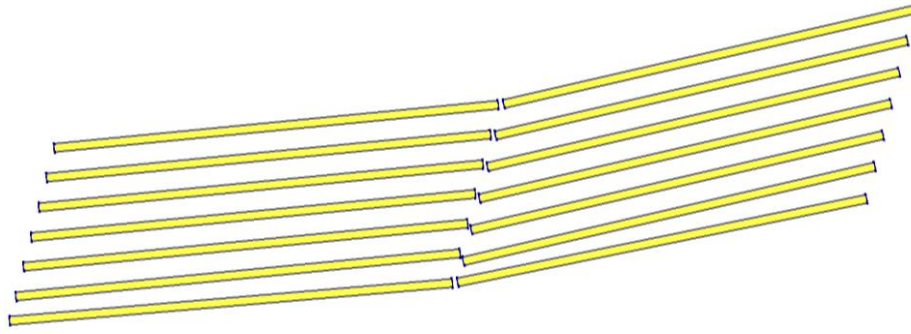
Top view showing PSC girders of Spans 1 and 2 in DIANA.
